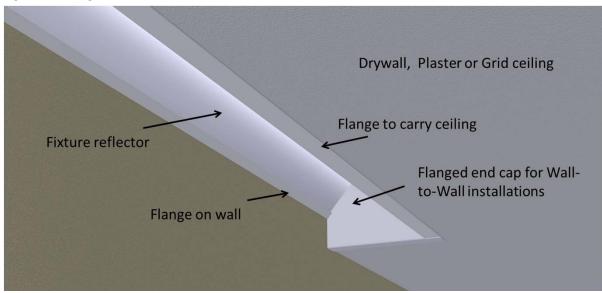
Detail D. Plaster Rail is not mudded into back wall, ceiling material is rested on fixture's visible flange. Fixture is shown butted against side wall.
